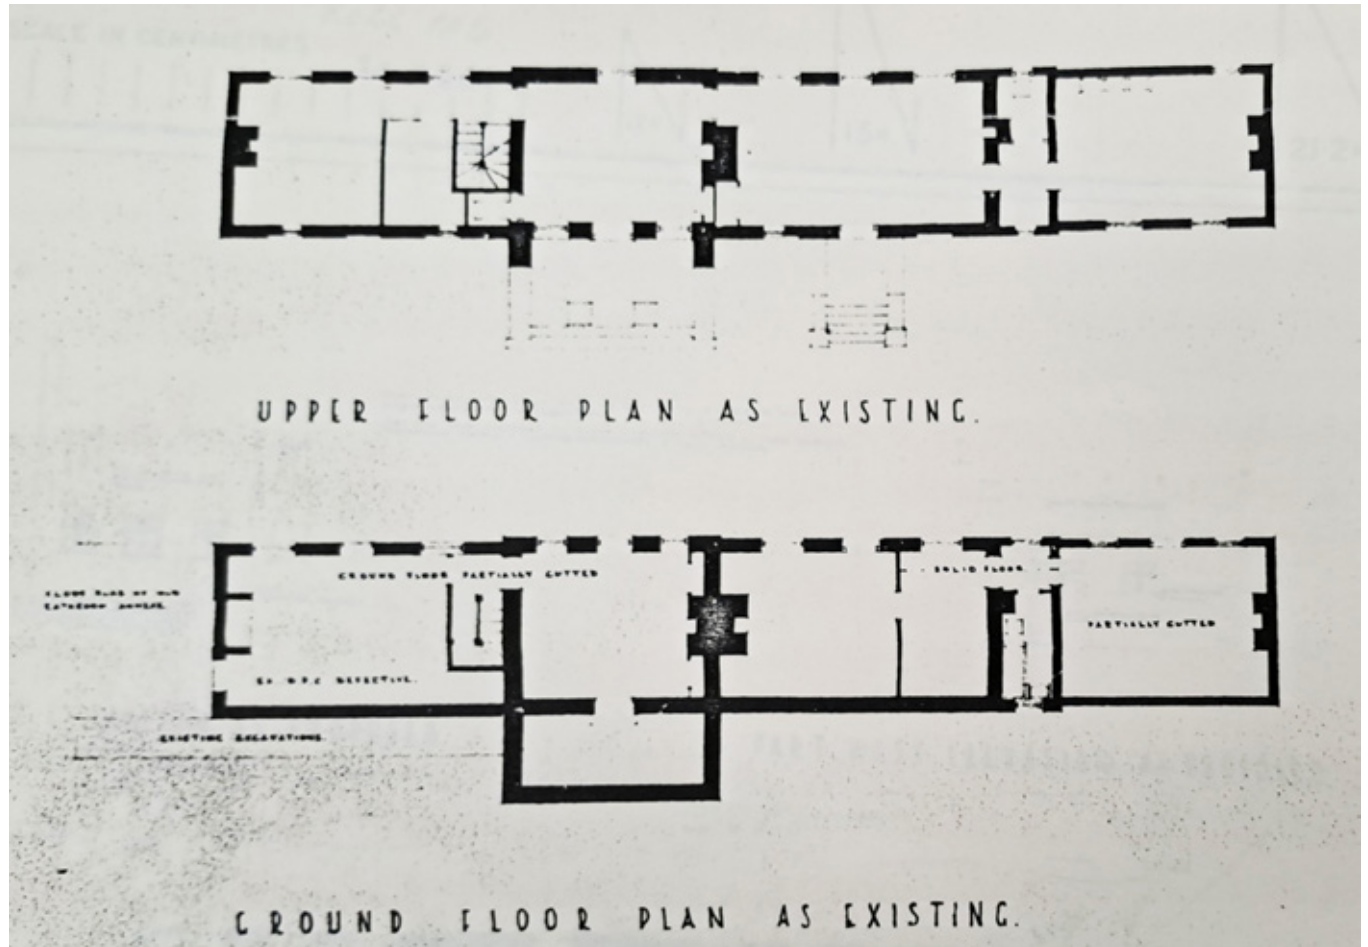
Ground and first floor plans as existing, 1957. City of London Corporation, HB/TEM/10.
